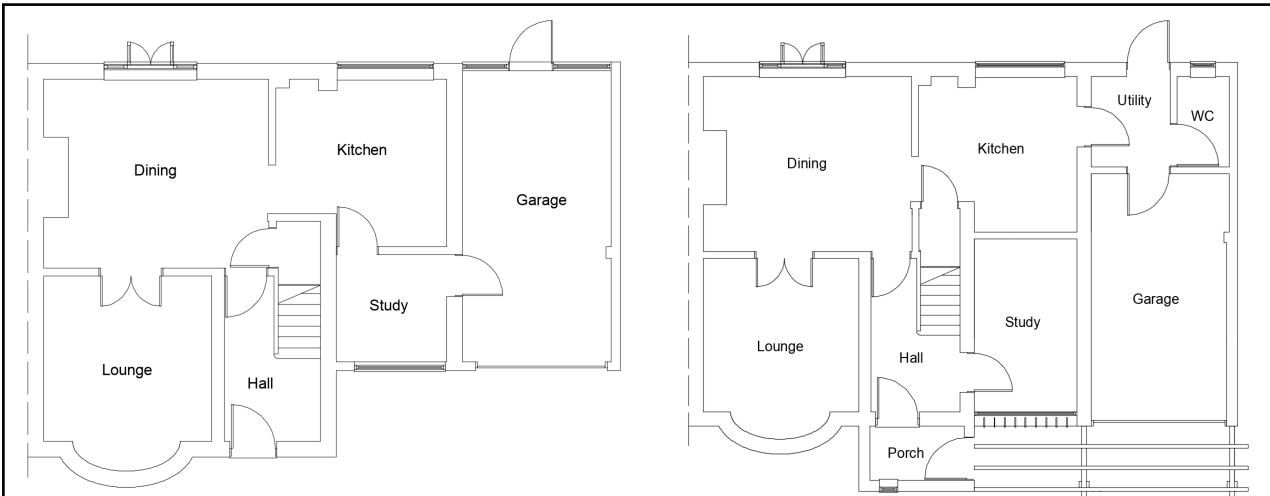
Left: Under the existing floorplan one accesses the study from the kitchen, which also forms a through-route to the garage. Right: With the proposed floorplan, one will be able to access the study from the hallway. This alteration will allow a doorway to be constructed between the kitchen and a new utility room constructed at the back of the existing garage. Access to the garage will be from the new utility room.
